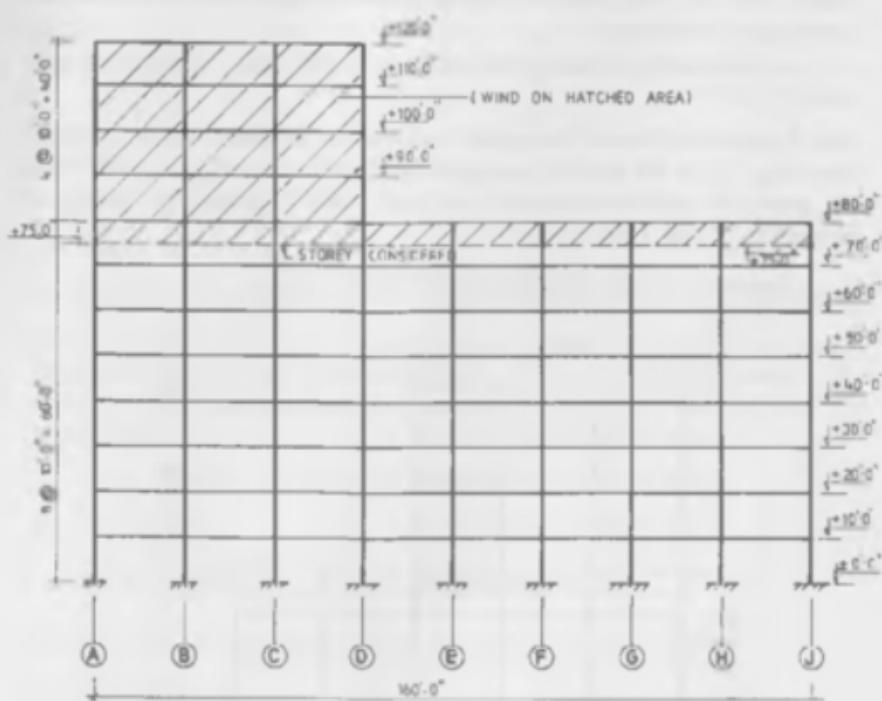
Plan and elevation of a building referred to in the illustrated example - front elevation.
